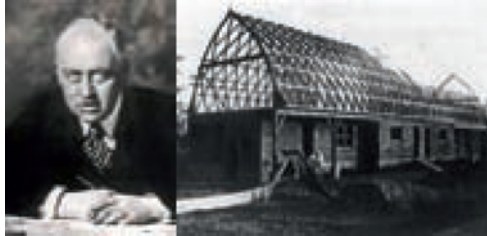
and 3. F. Zollinger and an original Zollinger Roof system in Merseburg, Germany.
